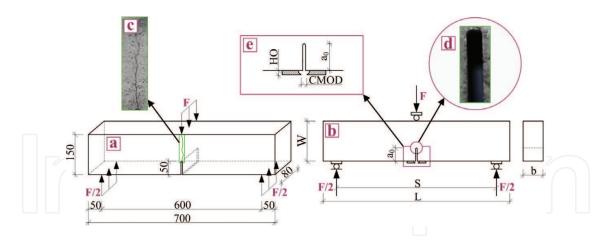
Specimen with (a) static scheme, (b) geometry, (c) exemplary crack paths, (d) blunted notch, and (e) details of calliper gauge holder.
